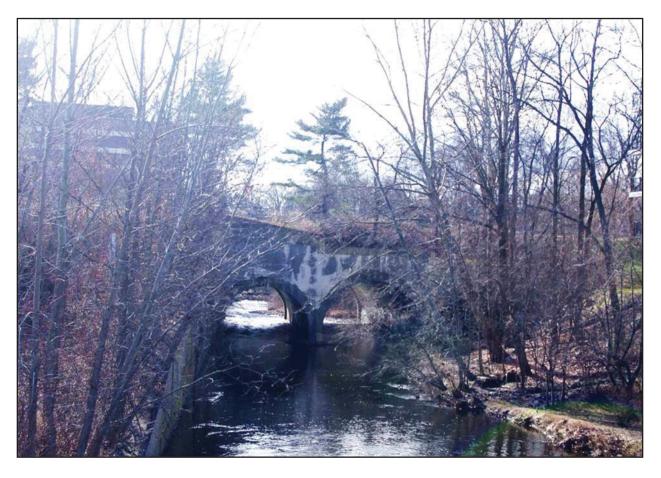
Merritt Parkway Main Avenue Bridge (Bridge Nos. 530A and 530B), south elevation, camera facing north.
